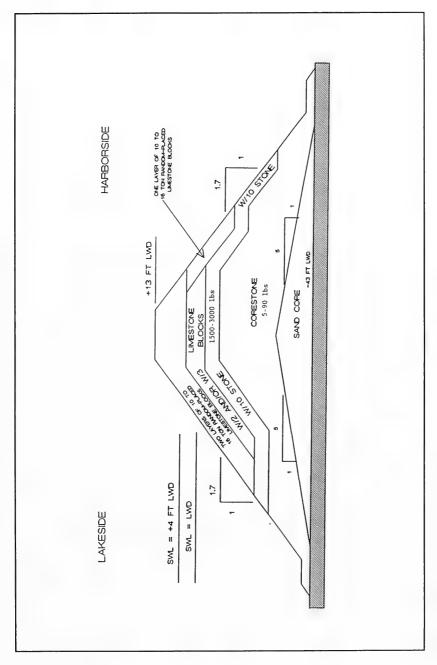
Plans 1, 1A, 1A1, 1A2 and 1A3
